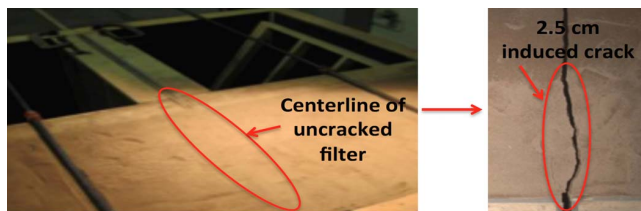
Images from laboratory earth embankment structure built at the USBR (left) and result of a 2.5 cm induced crack (right).
